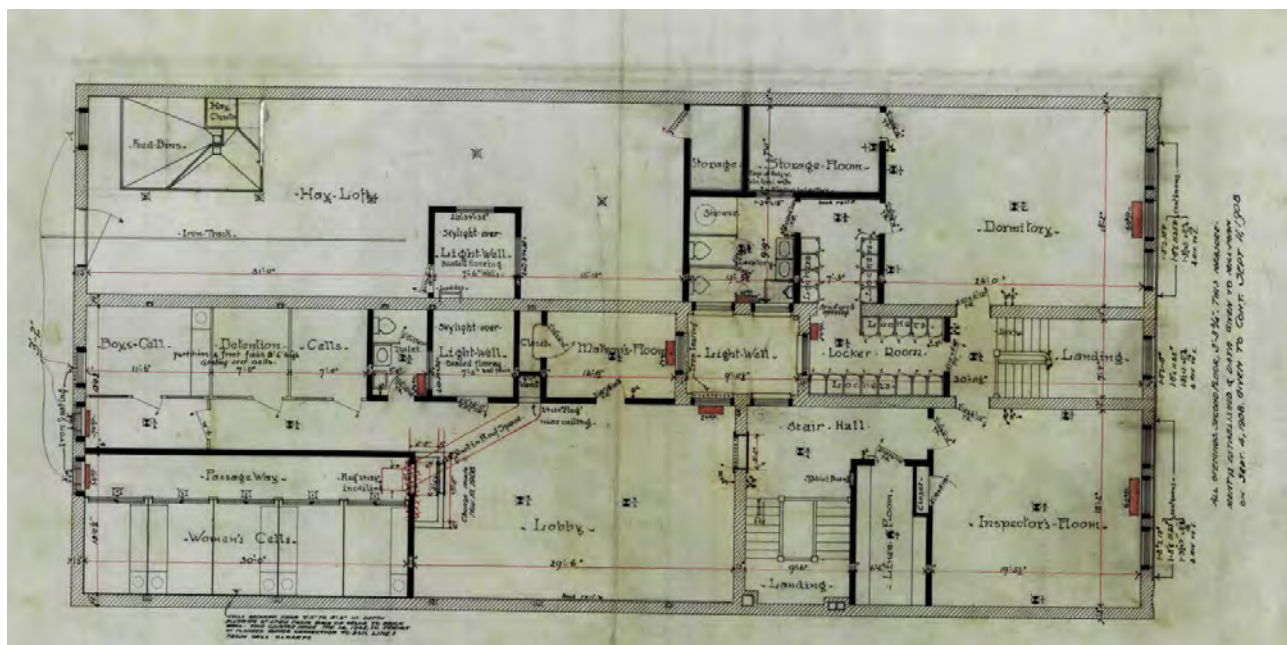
Second floor plan, showing the dormitory for night watch, patrol lockers, inspector's room, and women's and youth holding cells. (Courtesy Stotz Archives, MCF Architecture).
